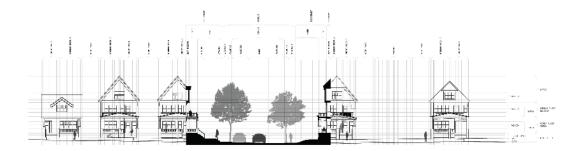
, Combined elevational and sectional drawing showing the streetscape of a residential street. (Source: Author)
